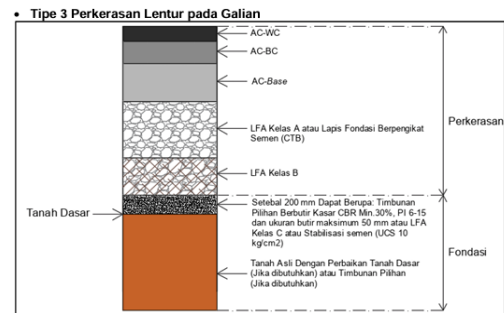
Structure of the Pavement Layers in the Excavation (Source: Ministry of General Affairs and Public Housing: Highways, 2024)
